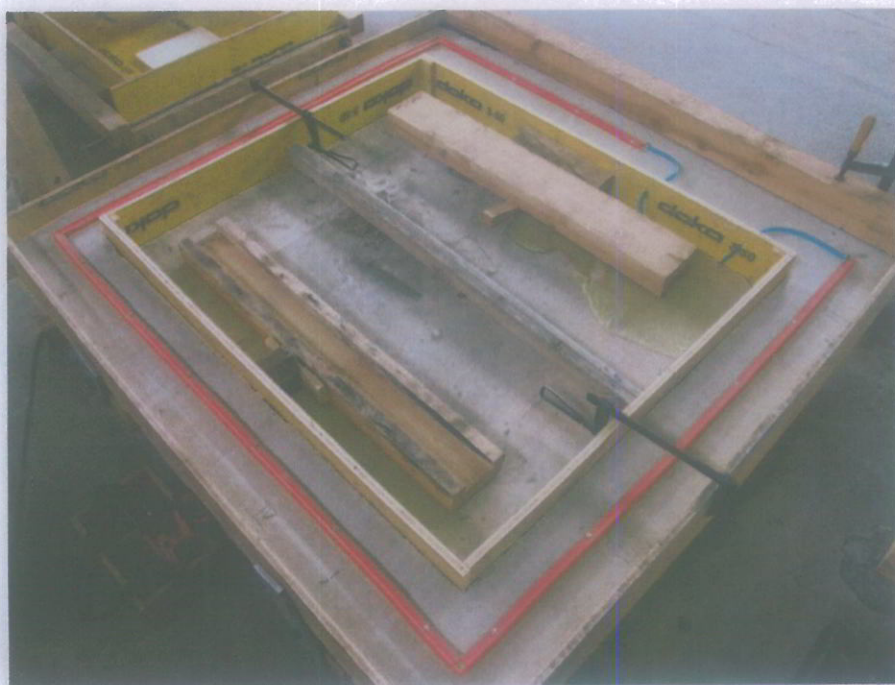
Installing the DRYset injection profile to test the injectability of a 6 m section
